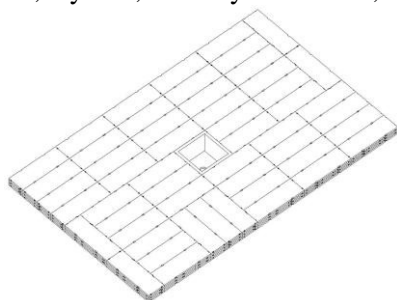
Space image and photo of the foundation for the drilling rig
